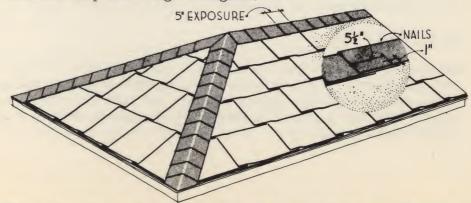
Hip and ridge finish with dutch lap application of giant individual shingles.
